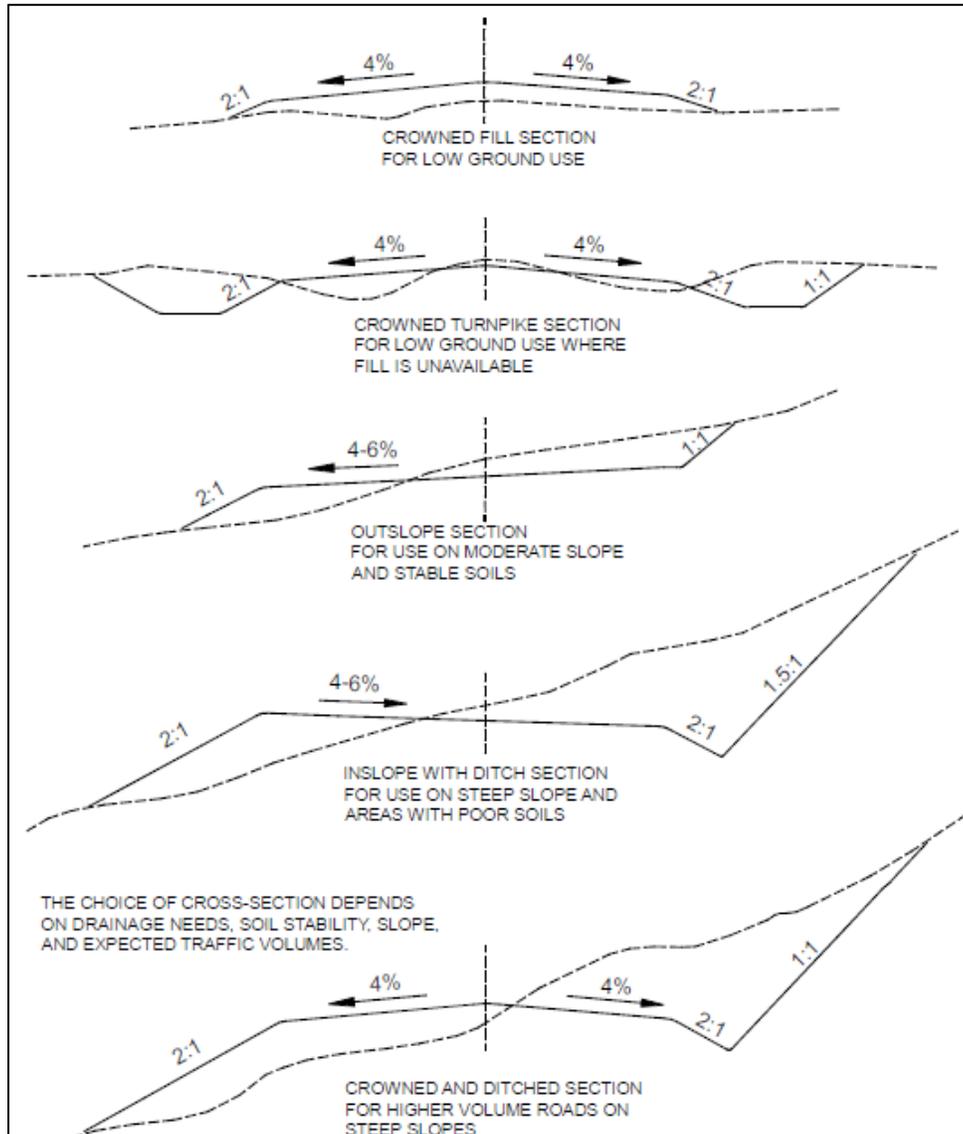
A: Access road cross section details. Adapted from VDEQ (2024).
